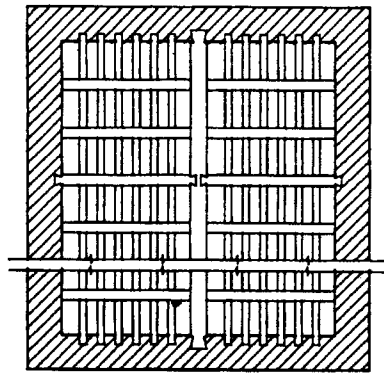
Detail in the connection between masonry walls and wooden floors.
